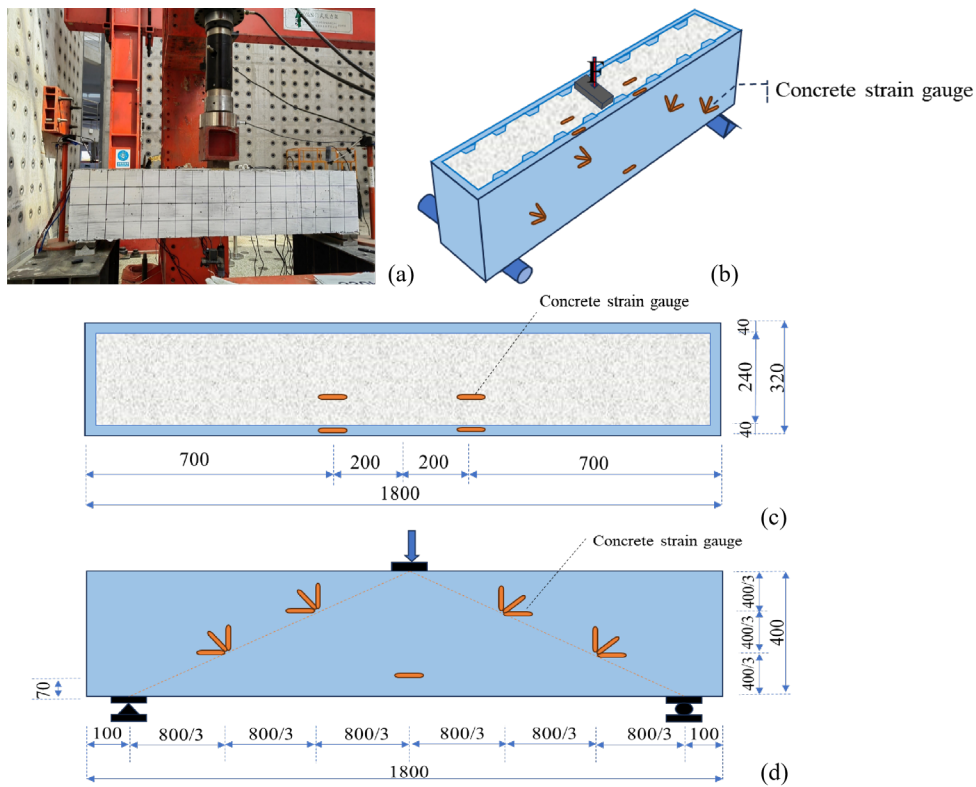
Model beam loading diagram: (a) on-site test loading arrangement, (b) loading schematic diagram, (c) strain gauge layout on top surface of beam concrete, (d) strain gauge layout on side surface of beam concrete
